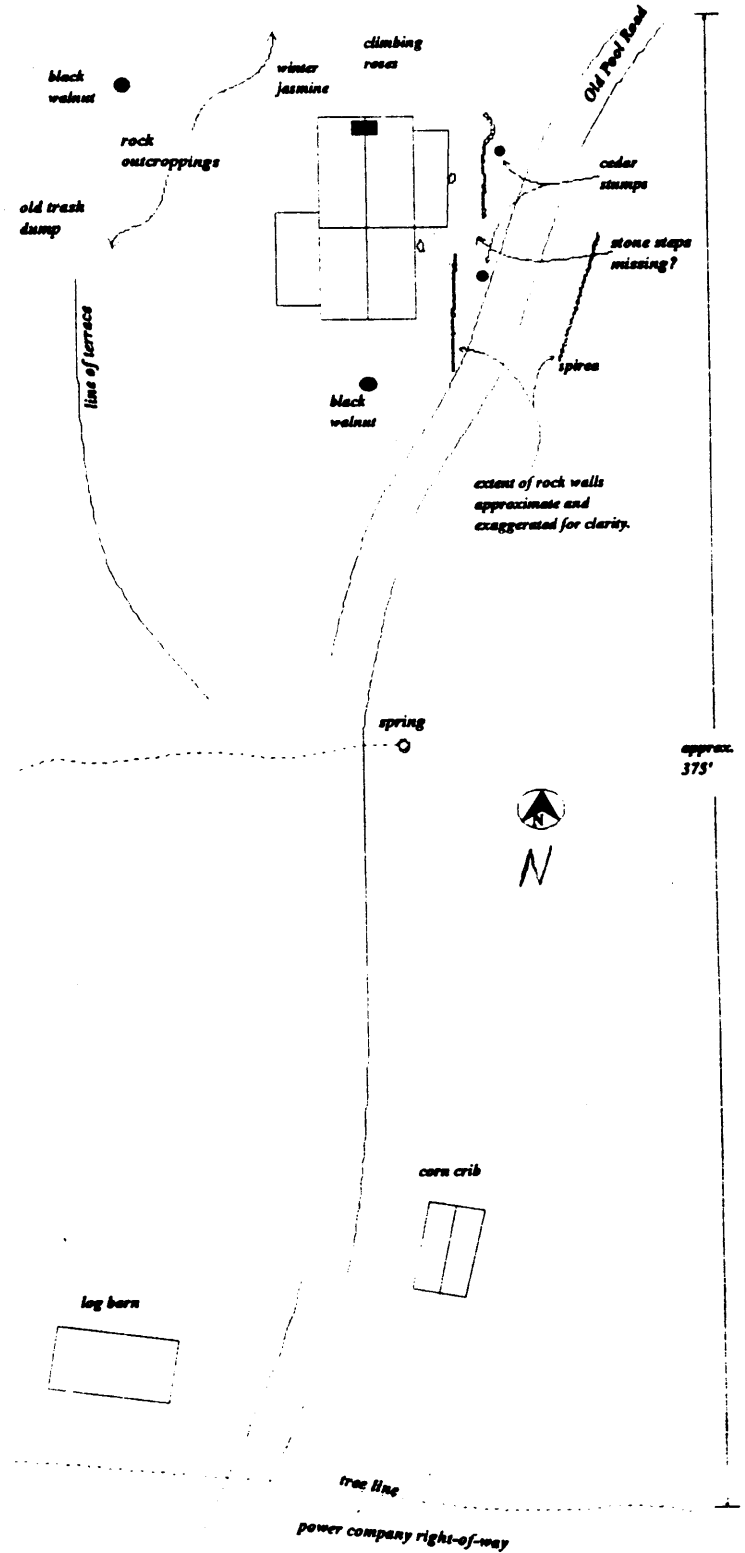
Sketch plan of Carnes House site. Scale is approximate.
